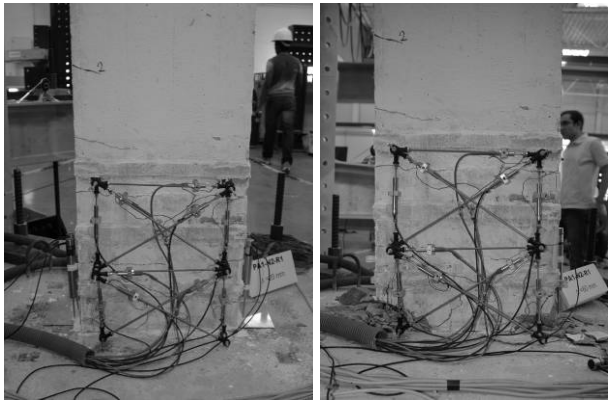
Damage on the retrofitted specimen PA1-N2: flexural cracking (left) and failure (right).
